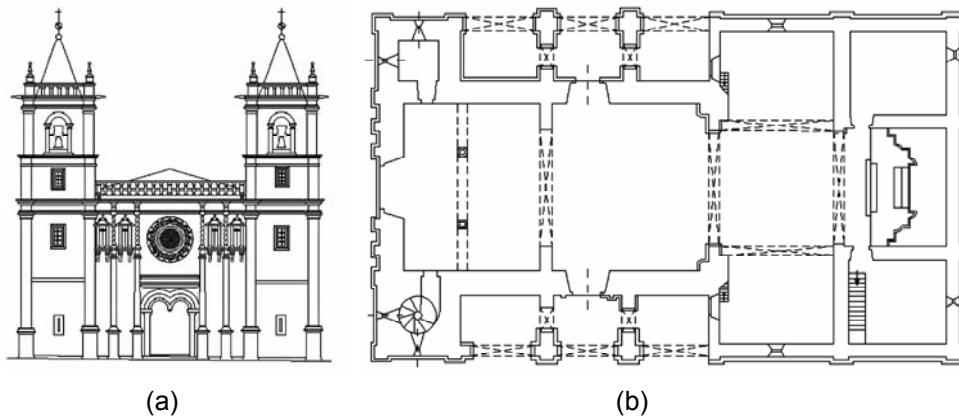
Geometry of Saint Christ church: (a) front view and (b) plan section
